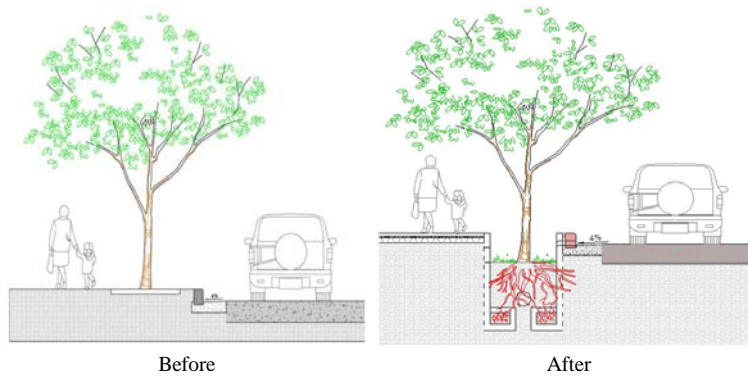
Illustration of planting ares in existing road and LID infiltration treebox filter installation in pedestrian road.
